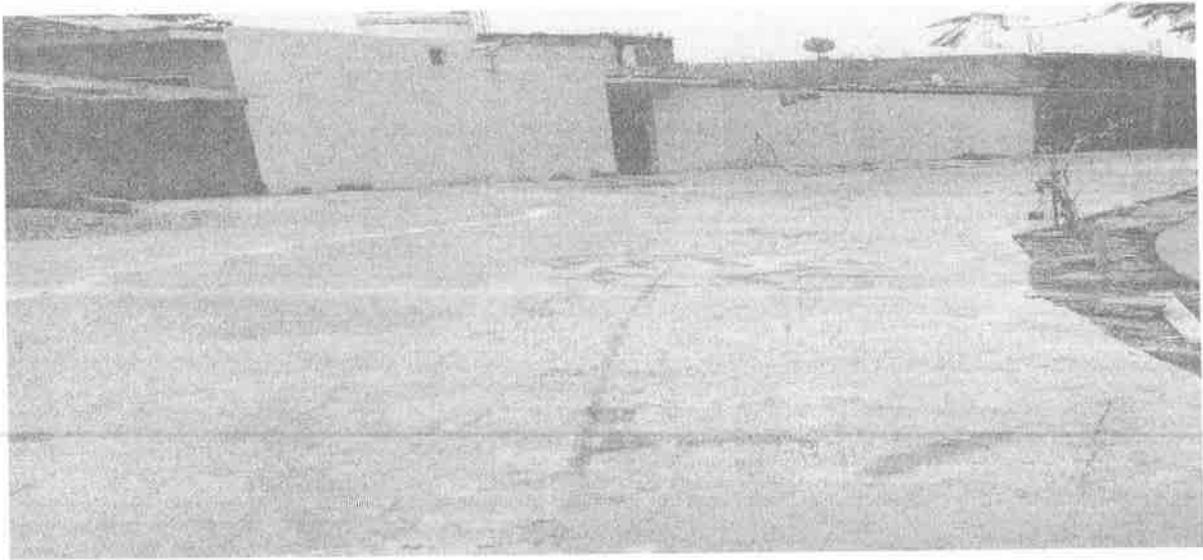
Wall painting of Tailoring Training Center Tundri
